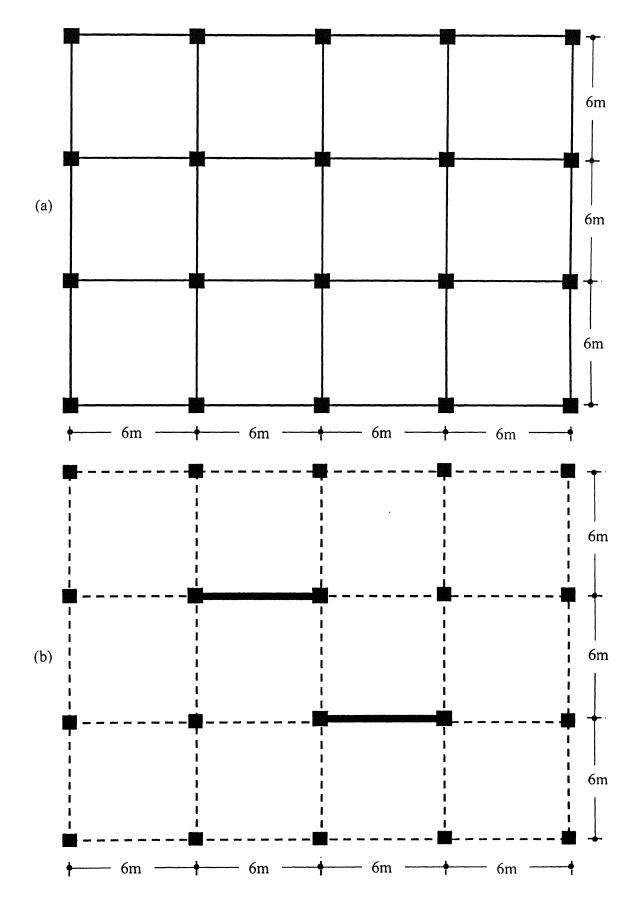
Plan of the building (a) with frames as structural system (Jain and Navin, 1995) (b) with walls as lateral load system and columns for gravity loads
